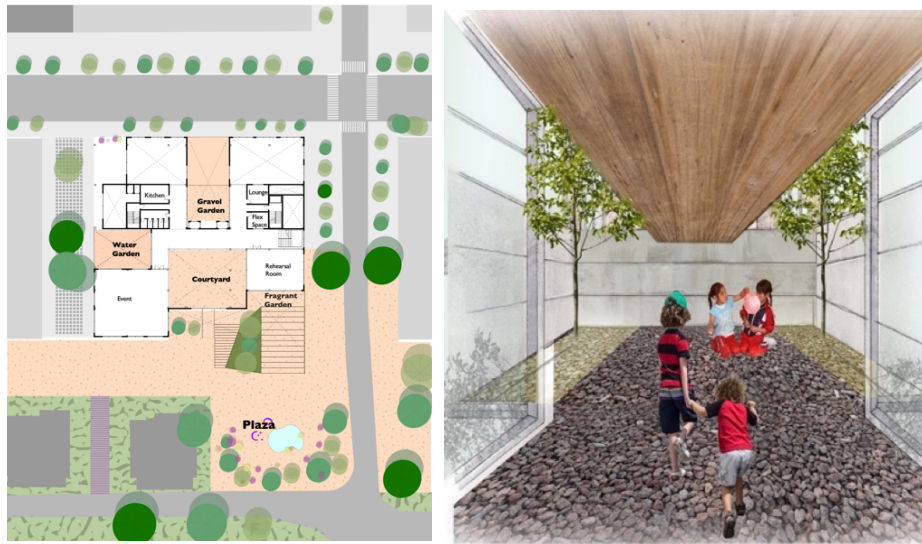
(Left) Lower Floor Plan, (Right) Gravel Garden (Source: Author)
